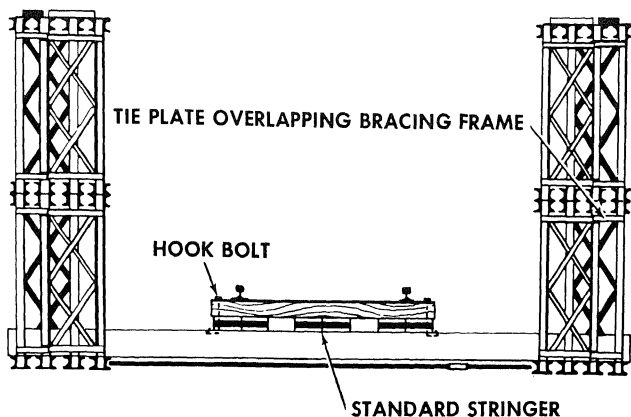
End view of 80-foot QD railway bridge built to carry the equivalent of Cooper's E-35 loading.
